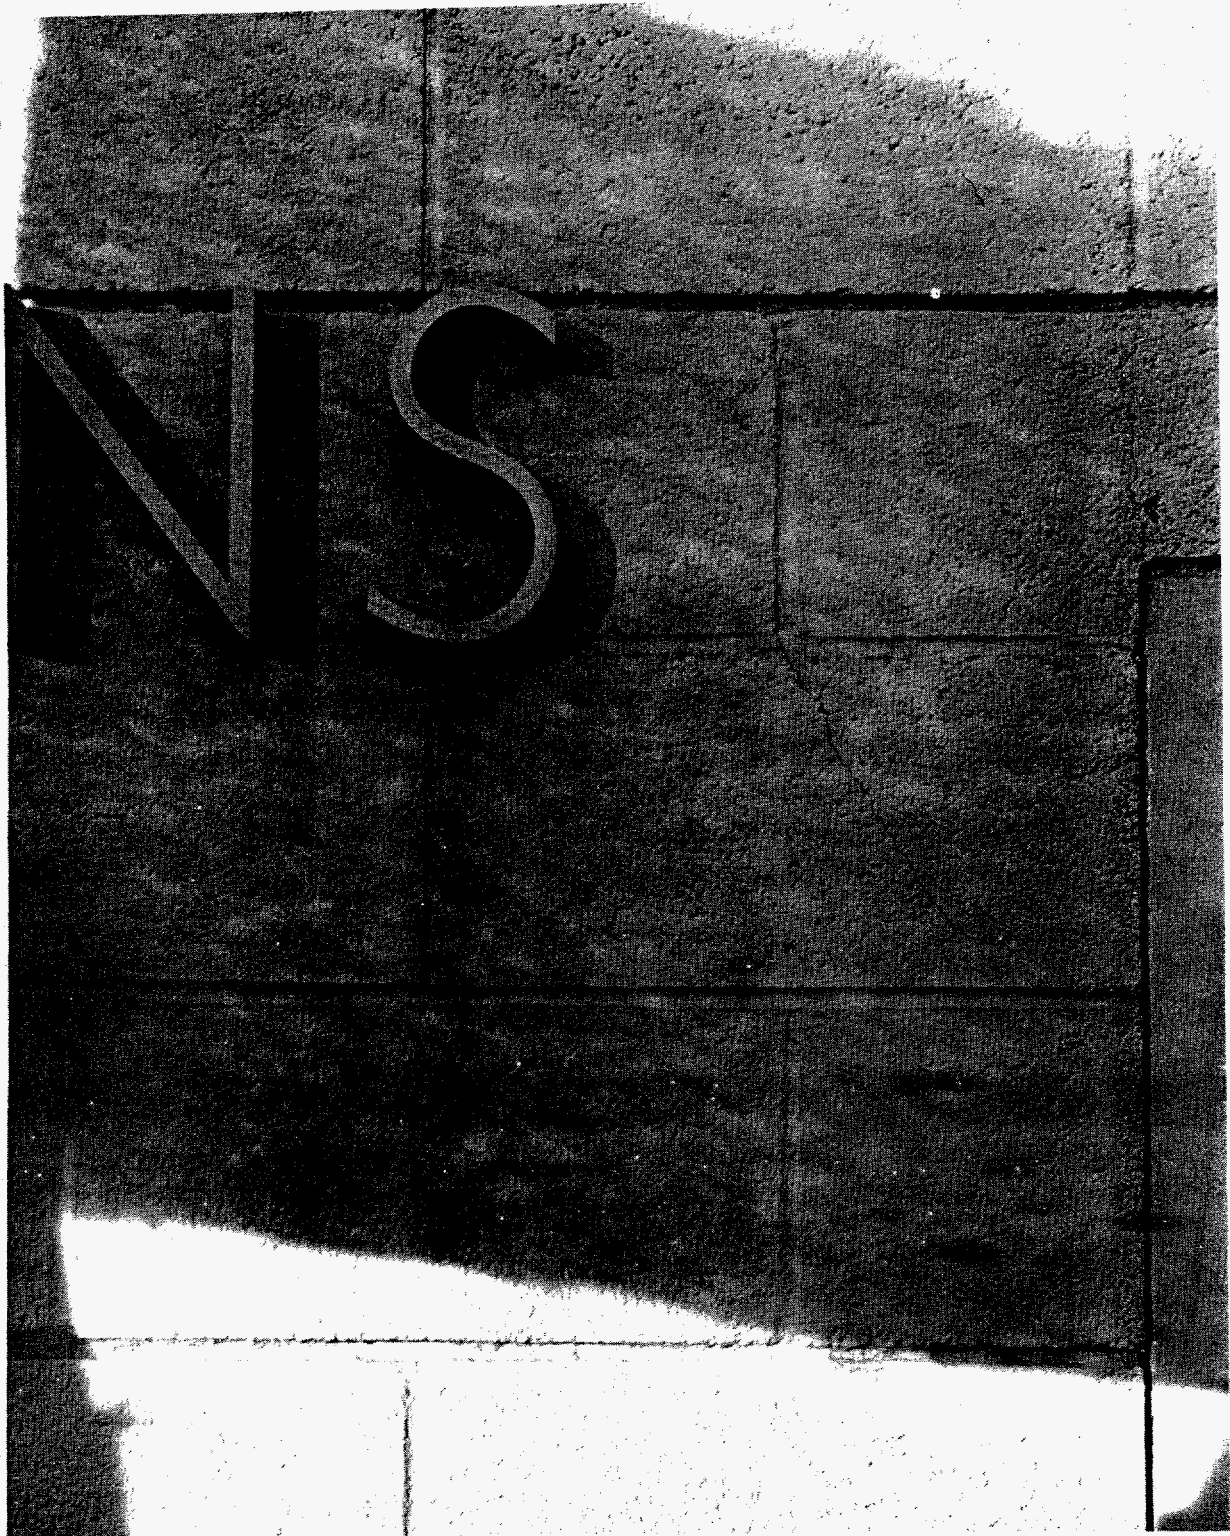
Building 726, 40-in. crack above "S" present on 1 and 7 Dec.; 16-in. extension of crack through "S" and a new 19-in. crack to the right present on 16 Dec., 0.21 cm/sec.
